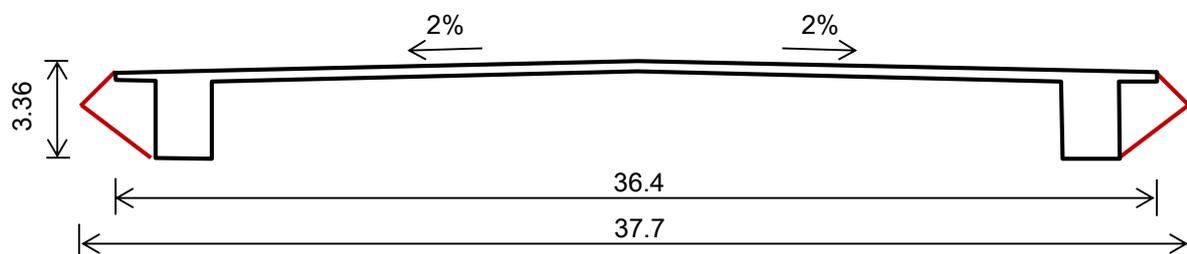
Girder shape and the locations of two stabilizer types (m).
